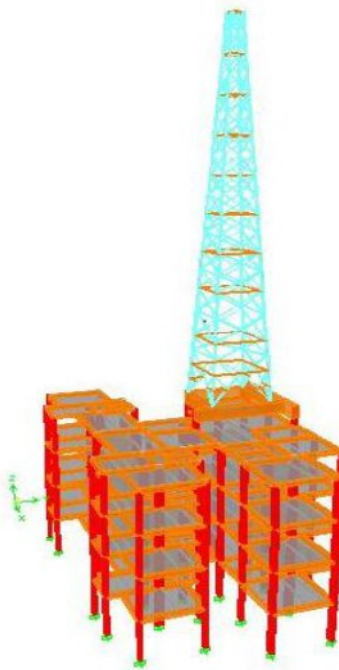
Typical model of rooftop tower mounted on existing three storey building
